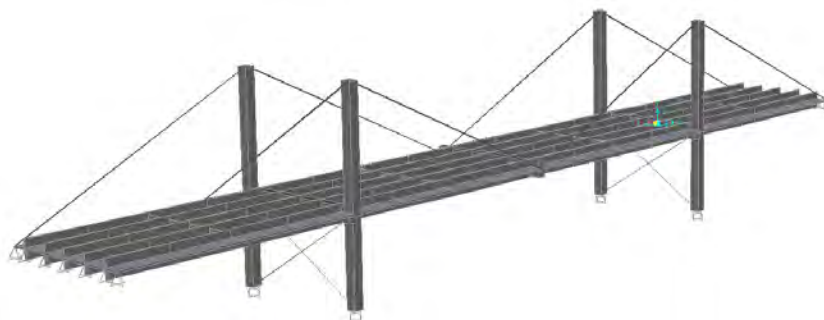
Layout of an existing bridge similar to the new bridge under design
